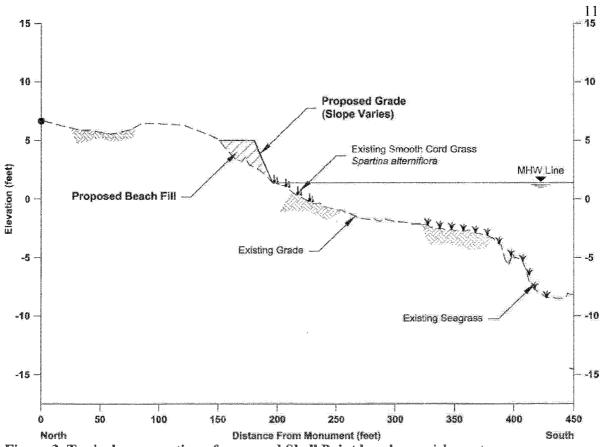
Typical cross section of proposed Shell Point beach nourishment.
